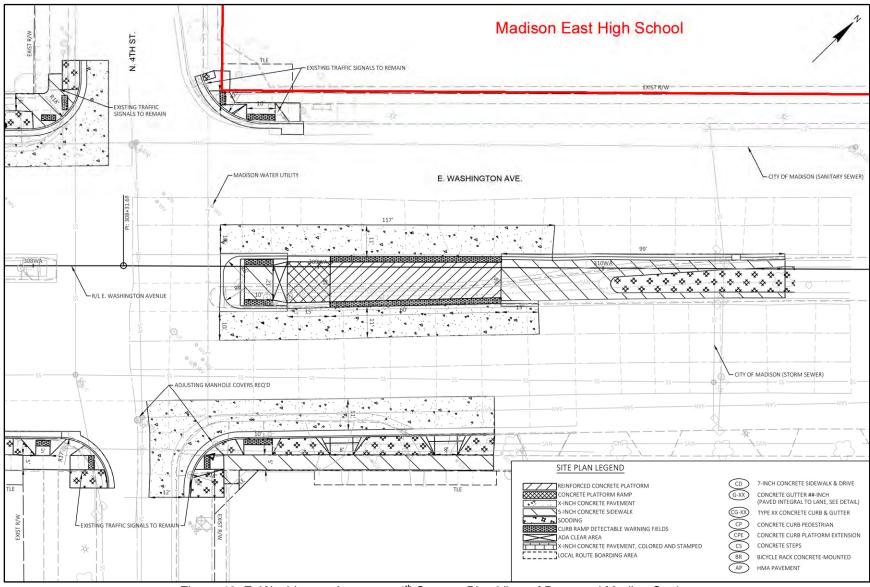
E. Washington Avenue at 4<sup>th</sup> Street – Plan View of Proposed Median Station In Vicinity of Madison East High School
